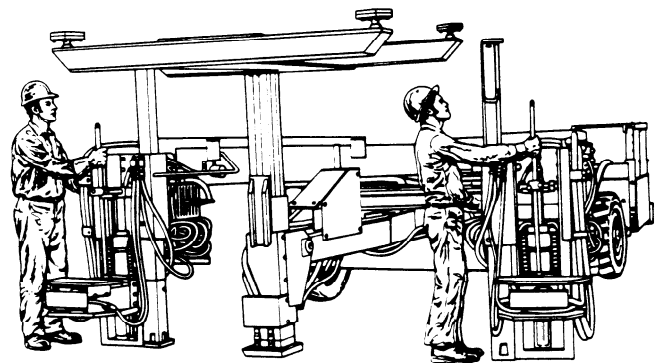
Roofbolting drill rig (from Roos, 1982, courtesy: Gardner-Denver Co.).
